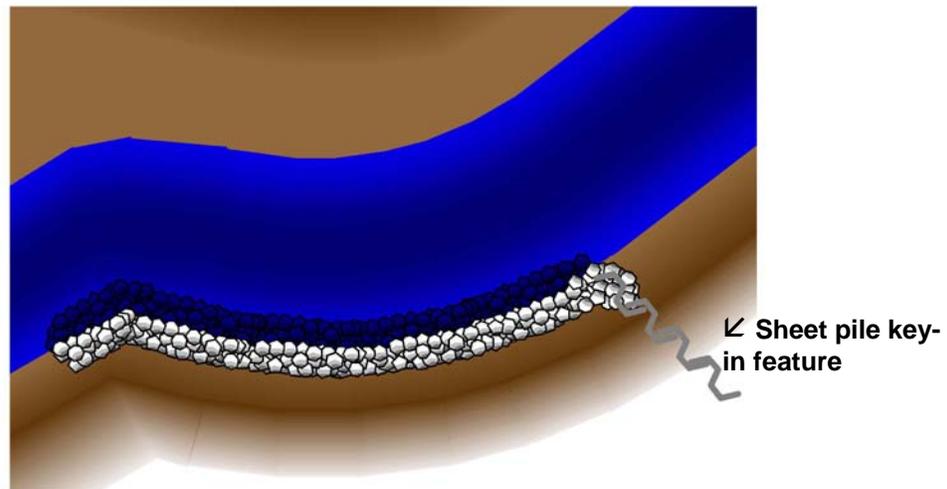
Conceptual rendering of Alternative 2 – stone toe and upper bank revetment with sheet pile key-in feature (plan view)
